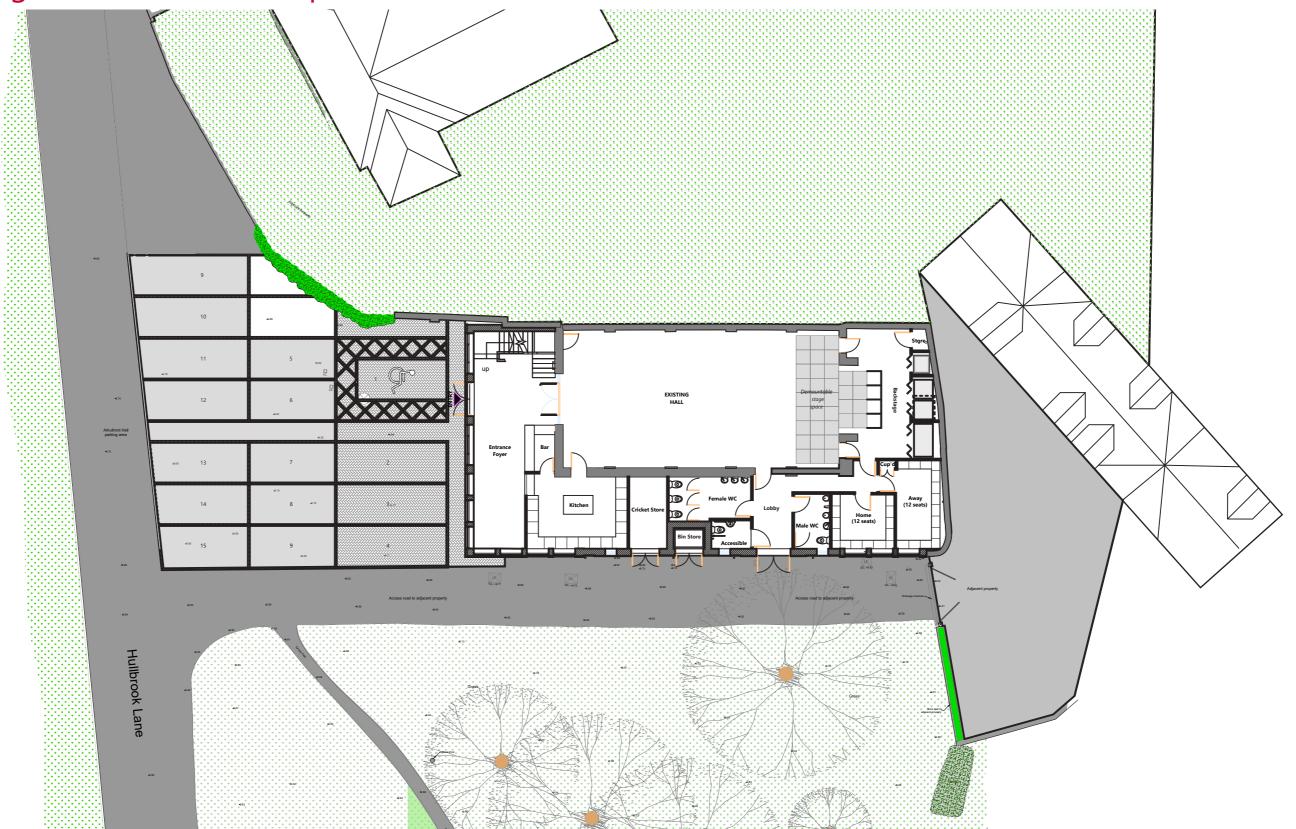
Proposed Ground Floor Plan (as presented by Richard Wilkinson)
